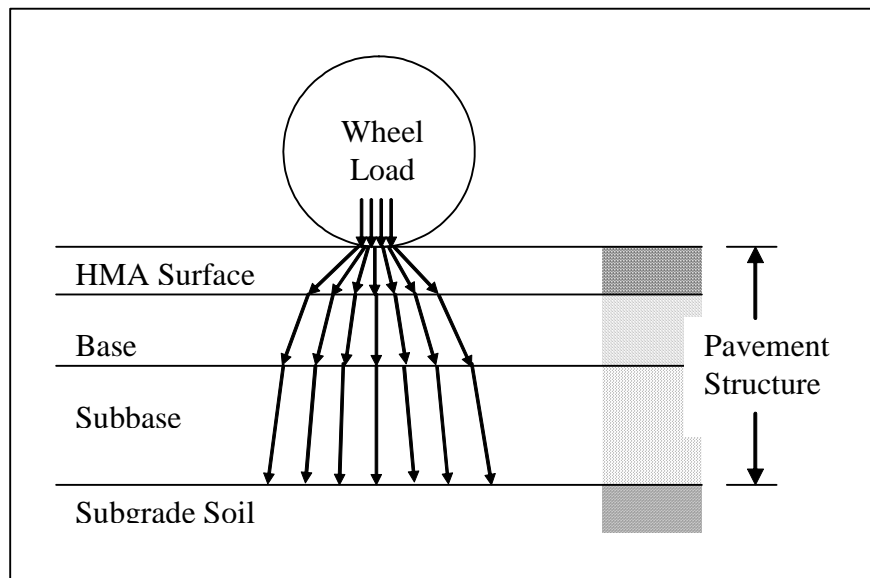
Typical flexible pavement structure and stress distribution (NHI, 2001)
